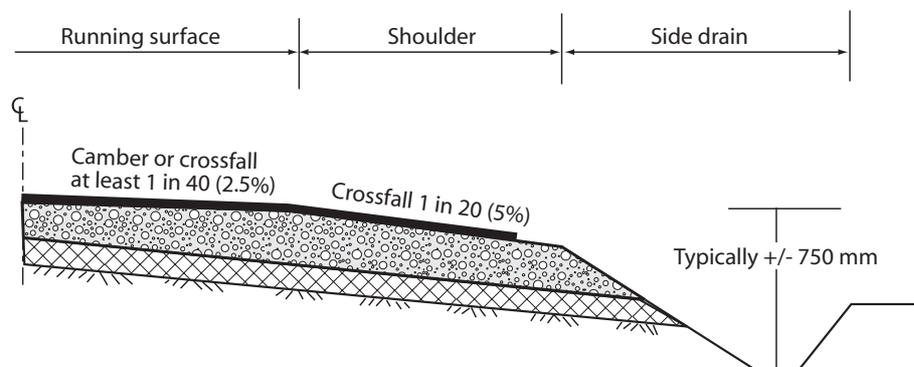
Ideal shoulder construction/drainage arrangements
